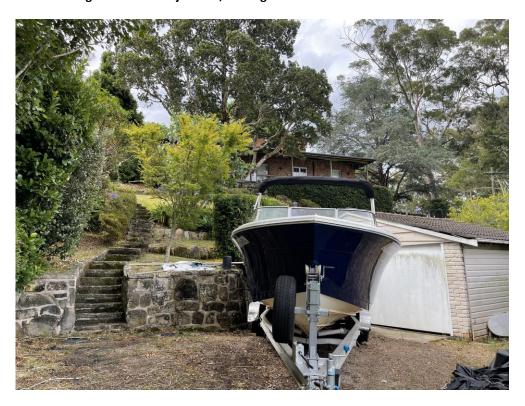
View of the existing garage and parking area at the Pittwater Road level (works unchanged in this area of the site), looking north-west
